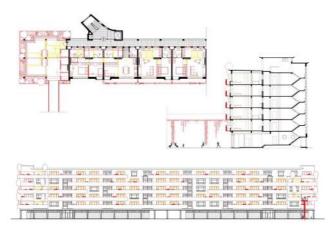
Parasite-strategy: addition of balconies creating collective open terraces on every other floor in the mid-rise buildings of the Jan De Voslei in Antwerp; floorplan, section and elevation. Source: Caroline De Queker and Toke Vanhove
